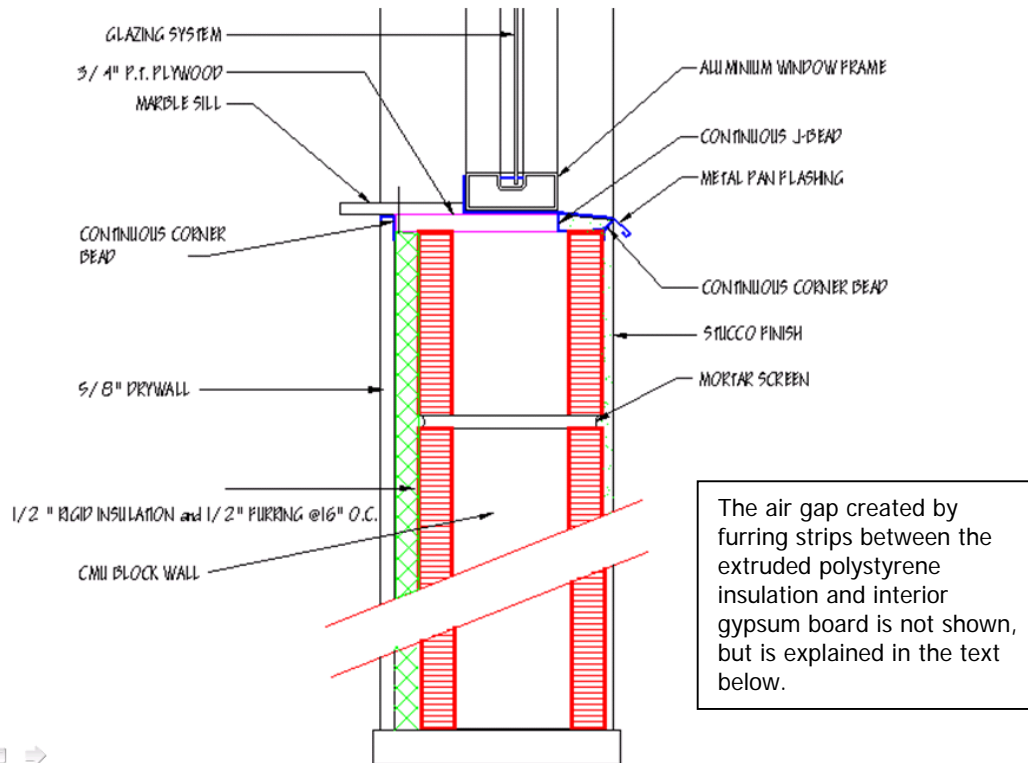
Cross Section of the CMU block Wall Showing the Different Layers and the Wall Window Interface
